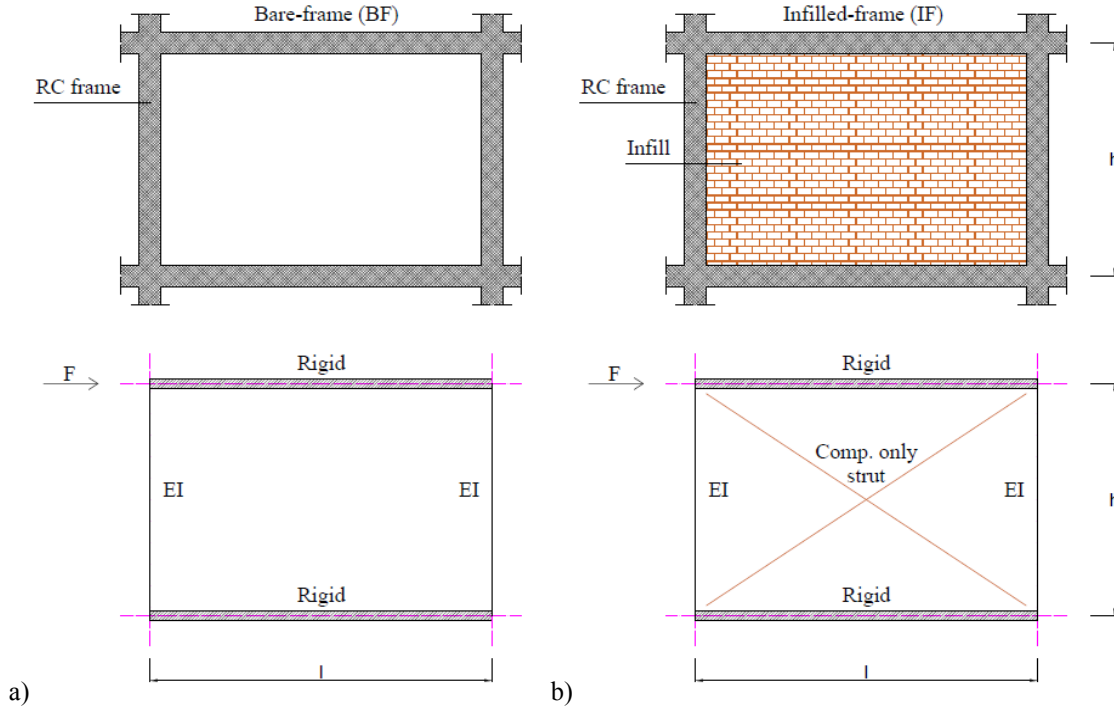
Sketches and static schemes of the reference frames considered: a) bare-frame, b) infilled-frame.
